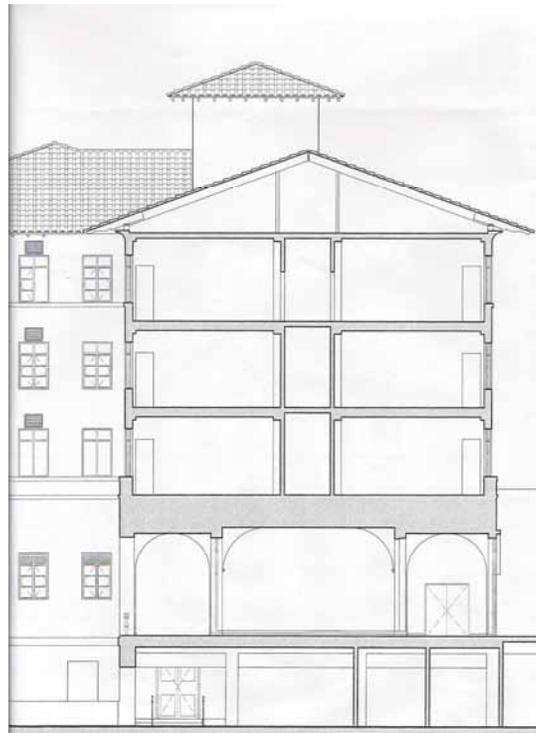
Section detail from As-built drawing, *The Office of Marvel and Marchand Architects*, October 2002
